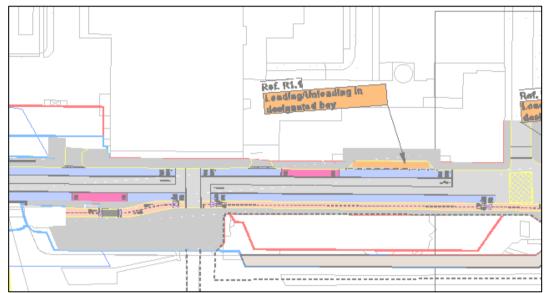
Proposed scheme design and parking changes along North Wall Quay (between CHQ and Common Street junction).
